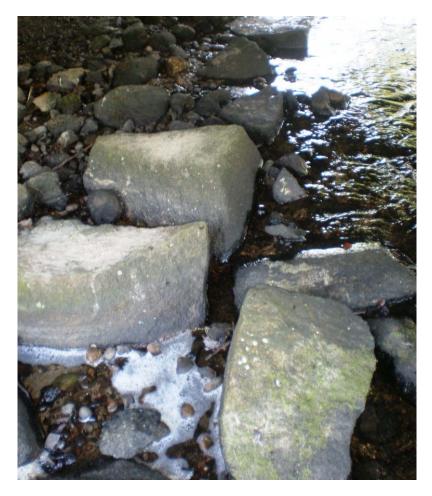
Possible outline of pier from bridge destroyed during the Civil War
